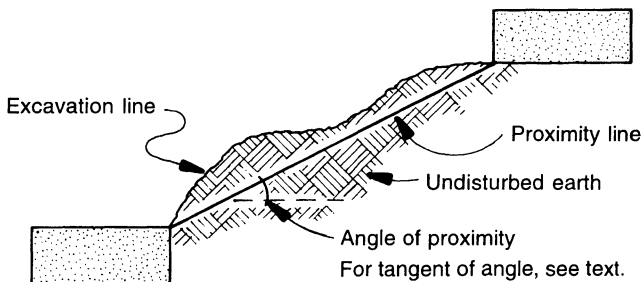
Recommended angle of proximity between adjacent footings of different elevations.
